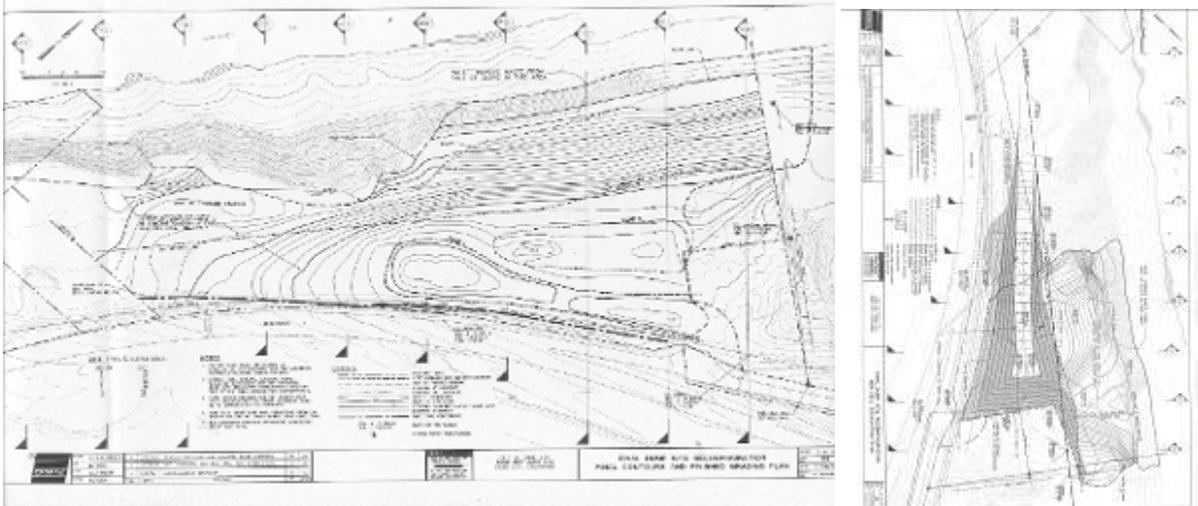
Final Grading Plan for a disposal site showing plan view of final topography; second drawing shows plan view of proposed waste cell to hold all reconfigured waste behind a 50-year coastal erosion set-back.
